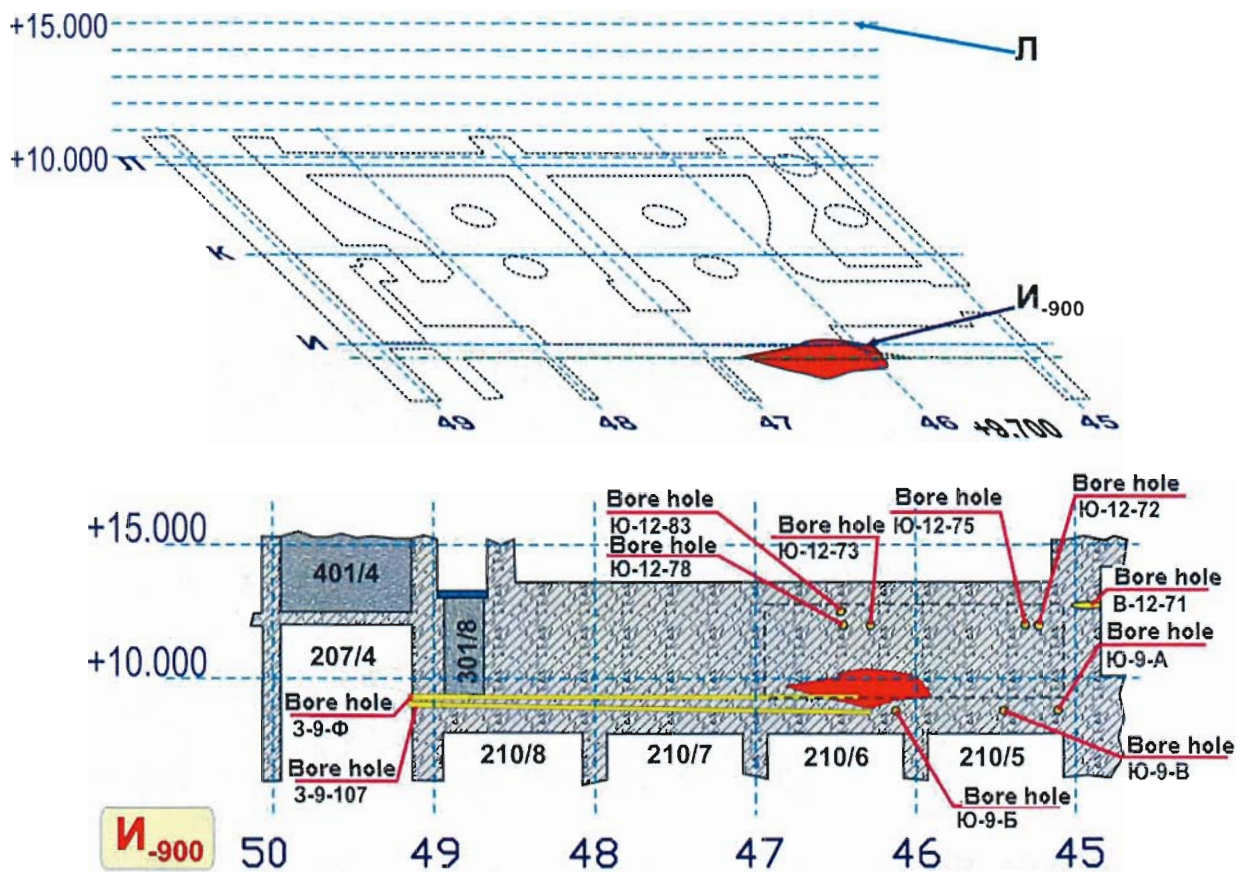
Separating wall in Room #305/2 and Room #304/3. LFCM. Section through row 'И-900'
